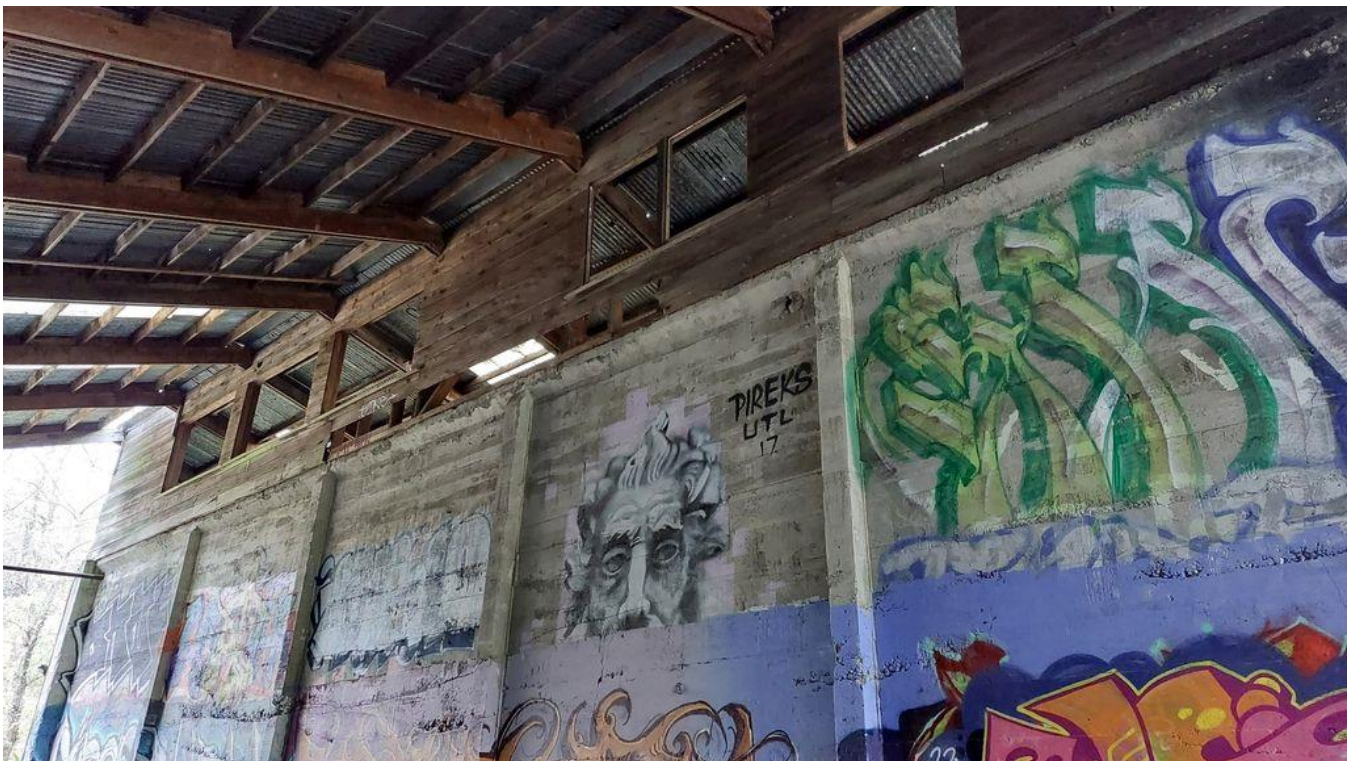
(left). Interior of north bay showing roof trusses, camera facing W
